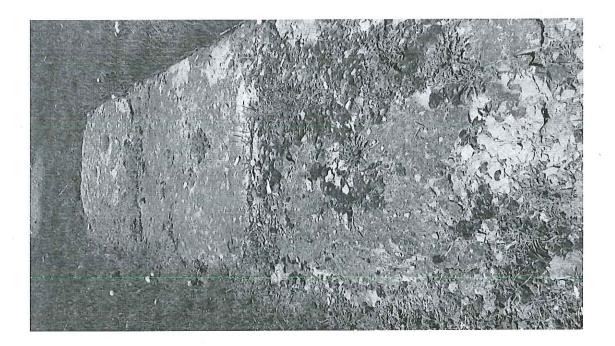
& 20 Lock walls buried east of exposed portion of Junction Lock Photos N. Reid, 2018
